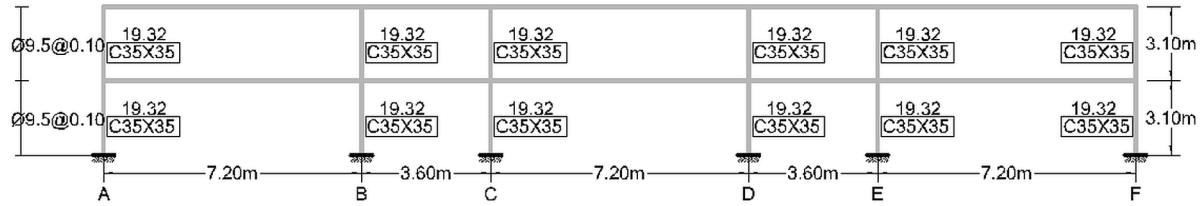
Educational facility, geometry and reinforcement in beams of the Frame 1
